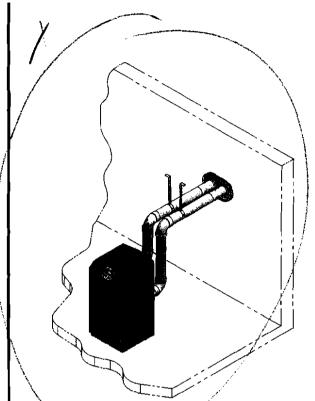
Two-Pipe Sidewall Termination - See page 17 for more details
